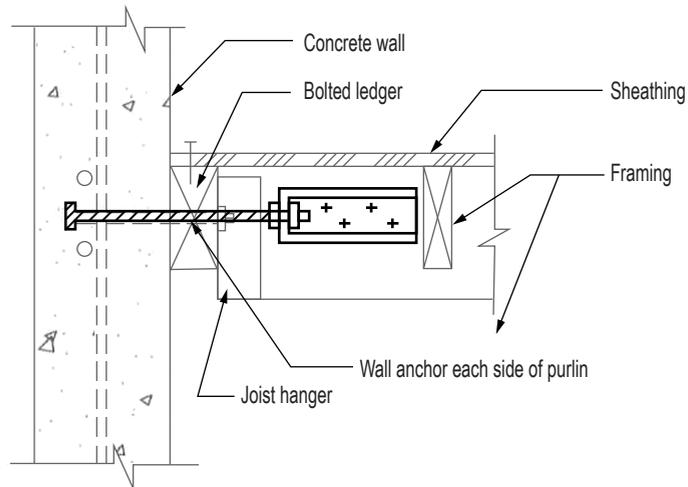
Concrete wall anchor to wood light-frame diaphragm or sub-diaphragm.
